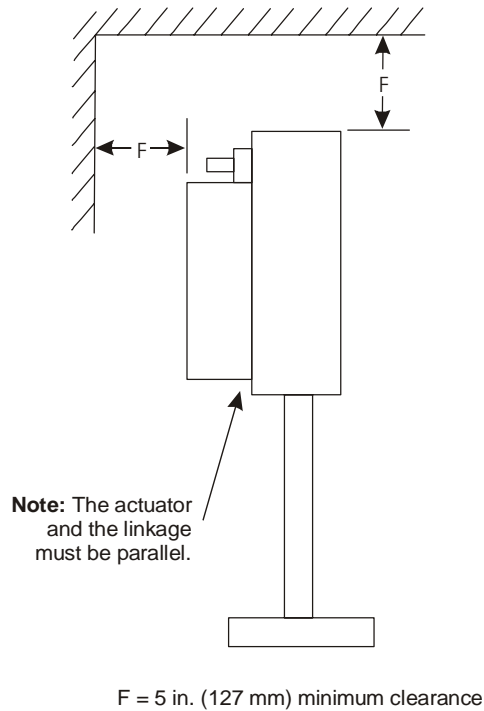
M9000-53x Series Valve Linkage Dimensions
